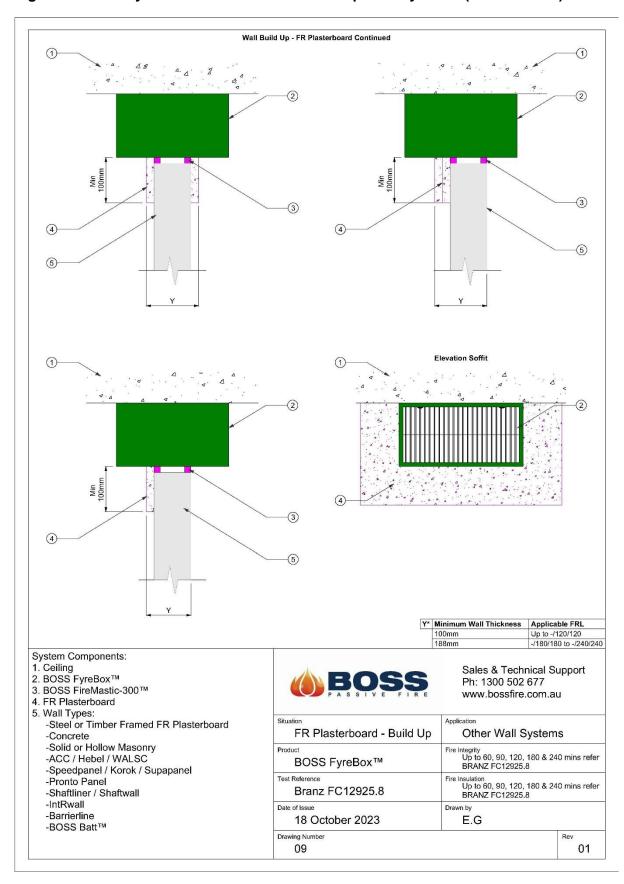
BOSS FyreBox[™] – Soffit Mount Built-Up Wall Systems (Plasterboard)
